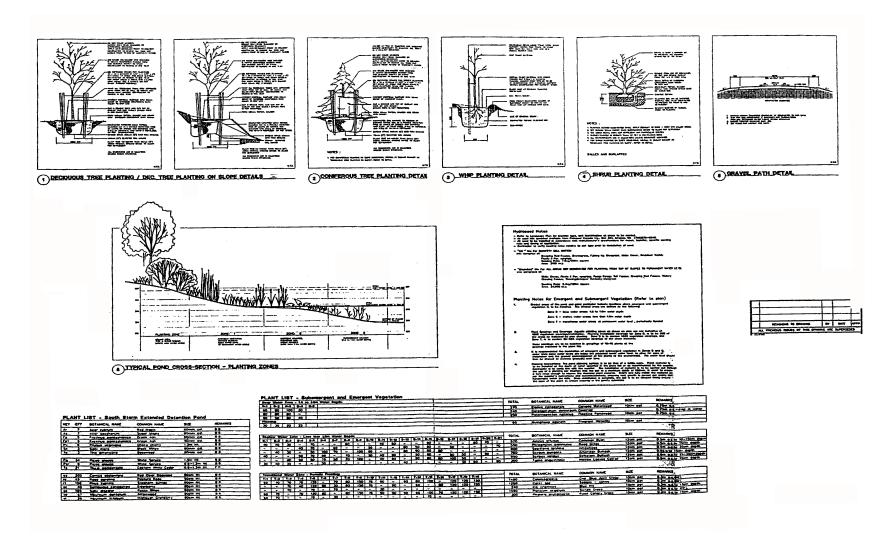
Planting Plan showing Plantings around the Border of the Facility
